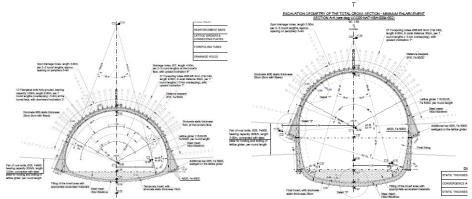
Conceptual cross-section of BKC south NATM tunnel excavation (heading and benching)⁹.
